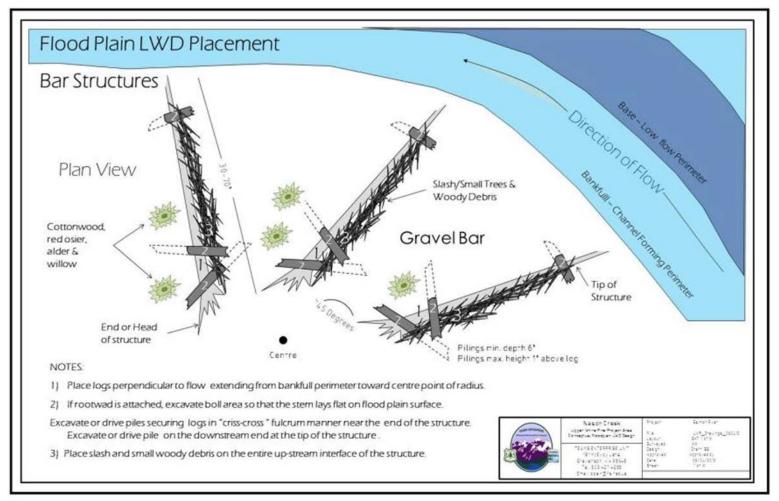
Typical flood plain large woody debris (LWD) placement plan view drawing
